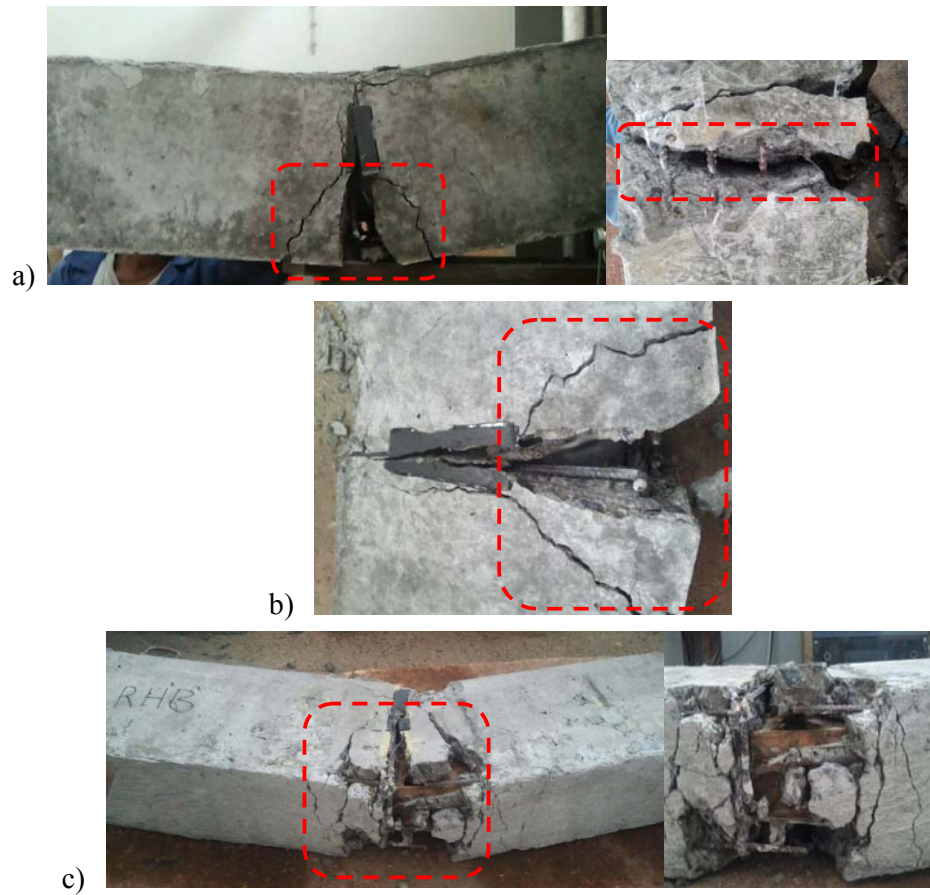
Pictures of the test specimens after failure a) solid section, b) circular hollow section and c) rectangular hollow section
